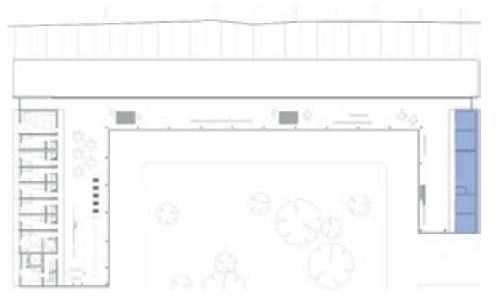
Spring Gardens: First Floor Plan, with assessment rooms highlighted
